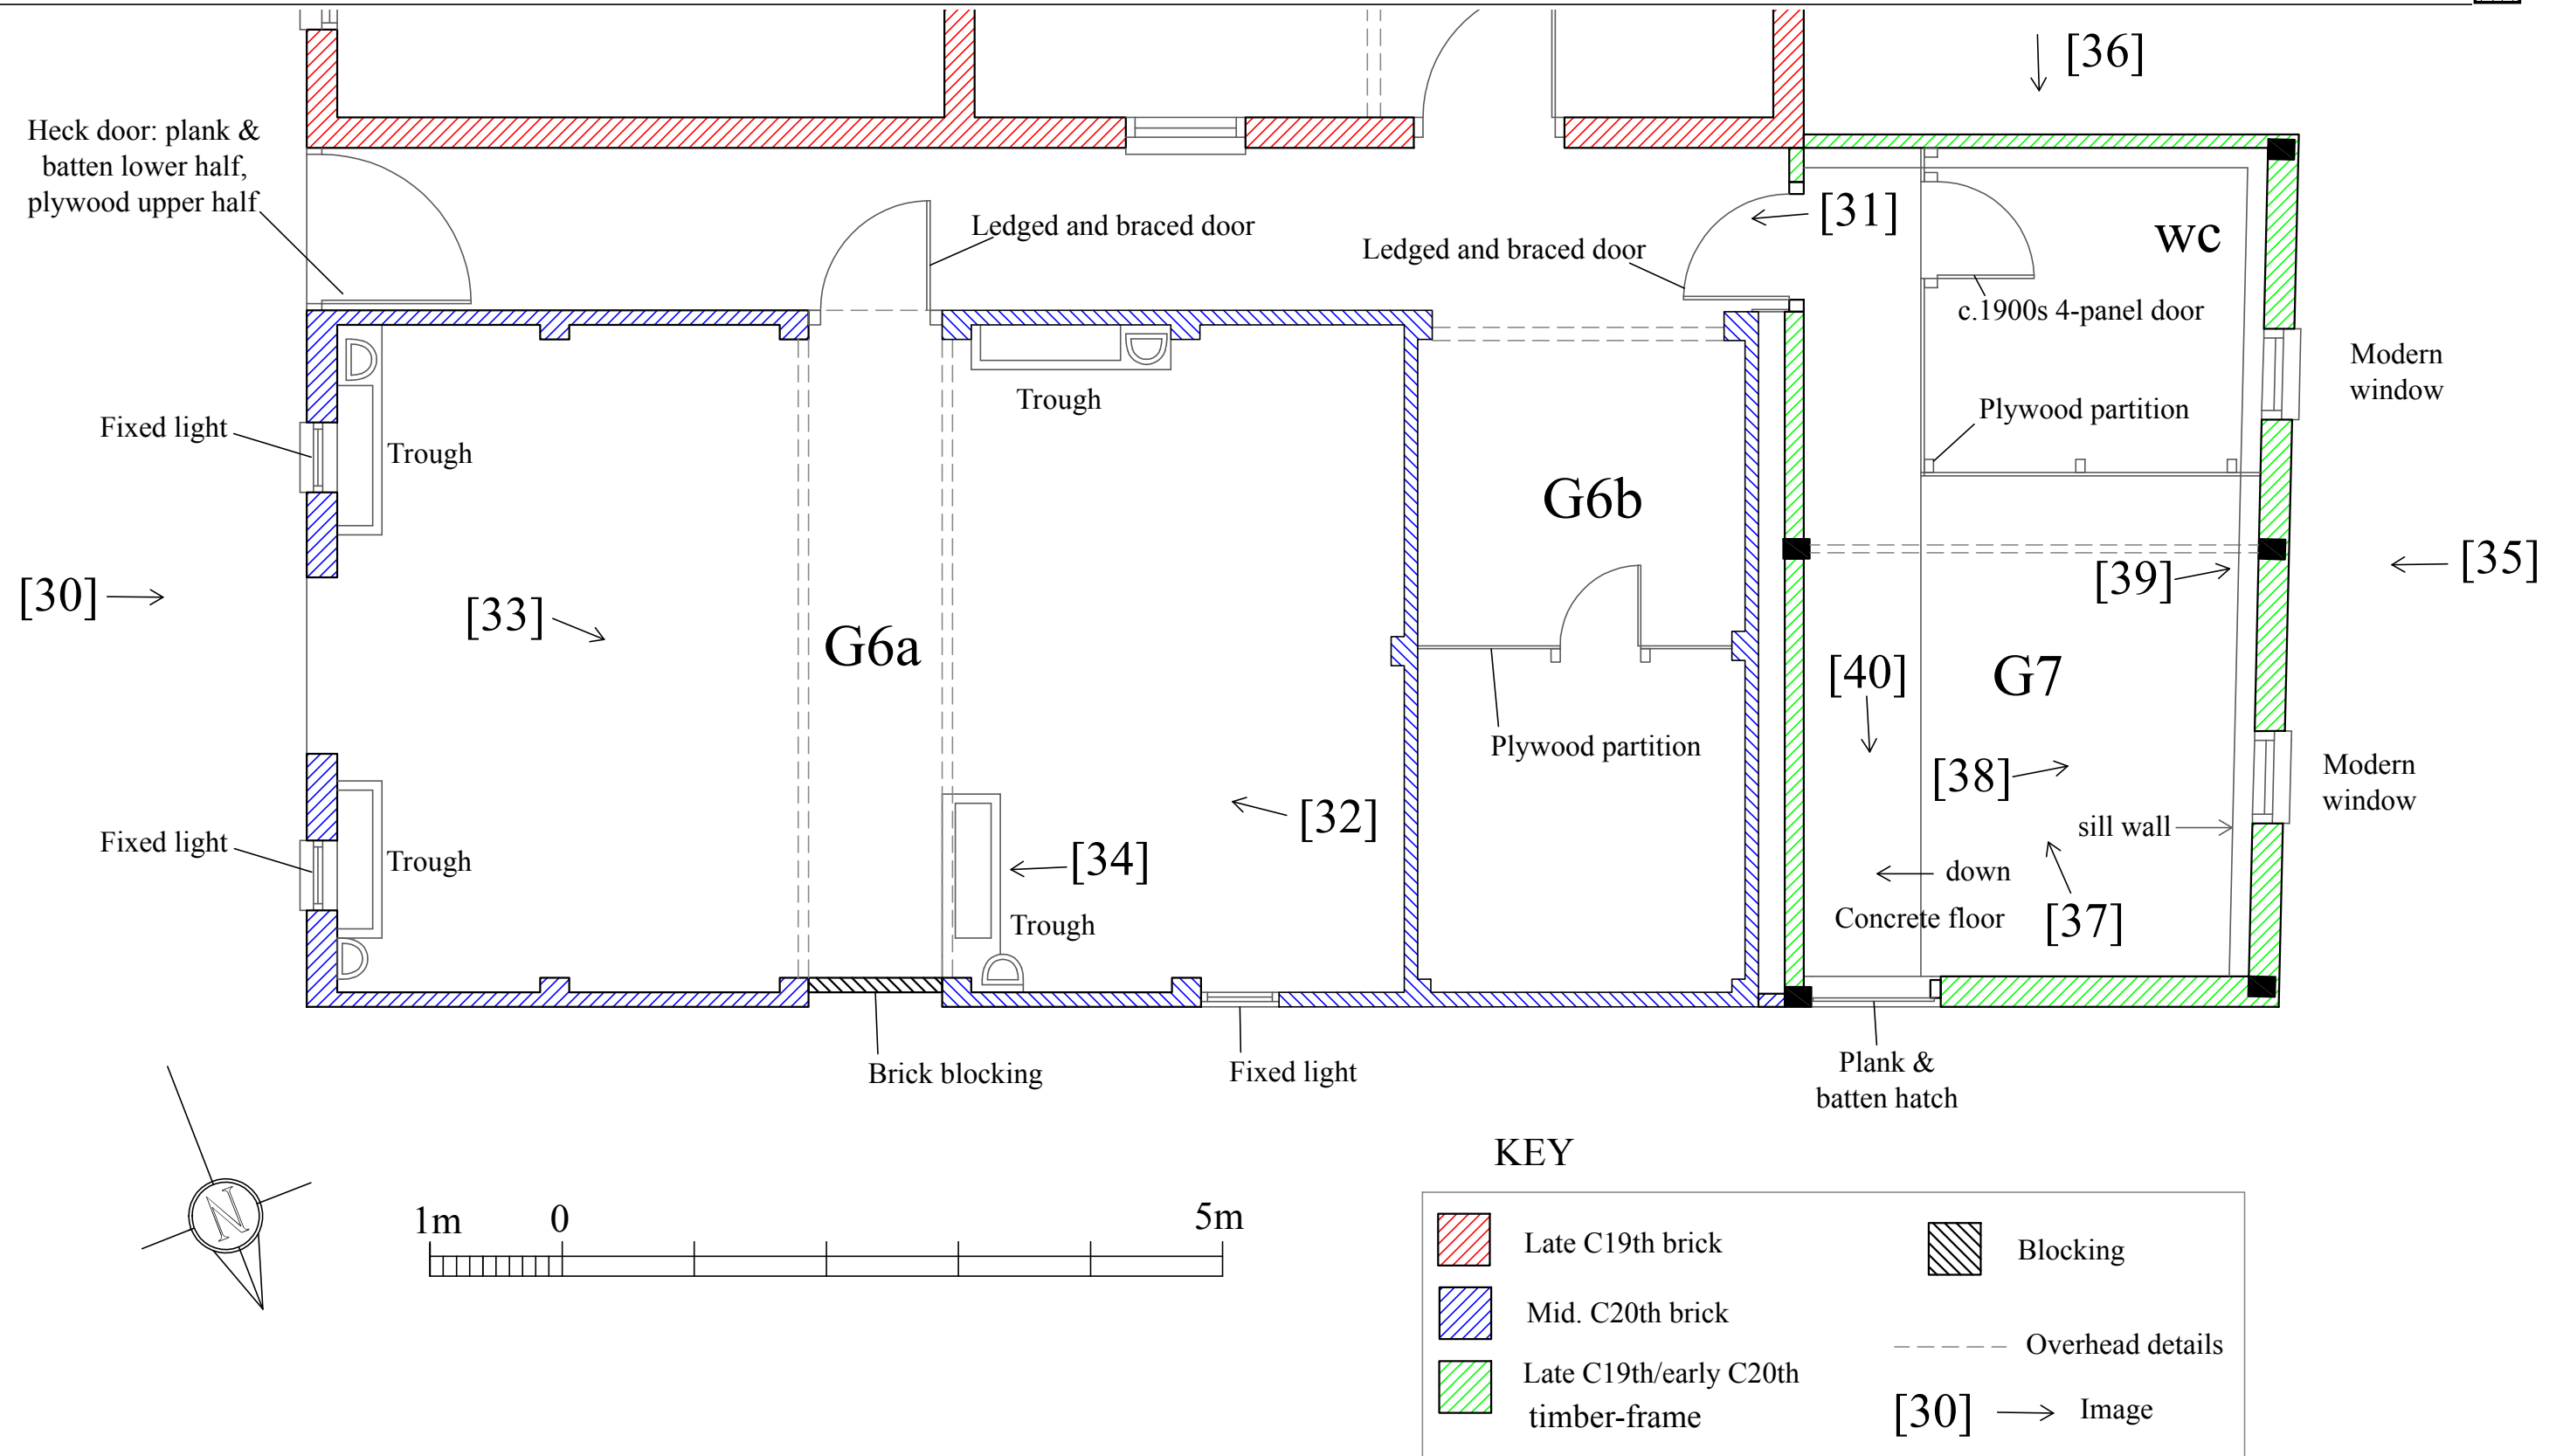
Detailed plan of brick lean-to and timber-framed shelter shed
